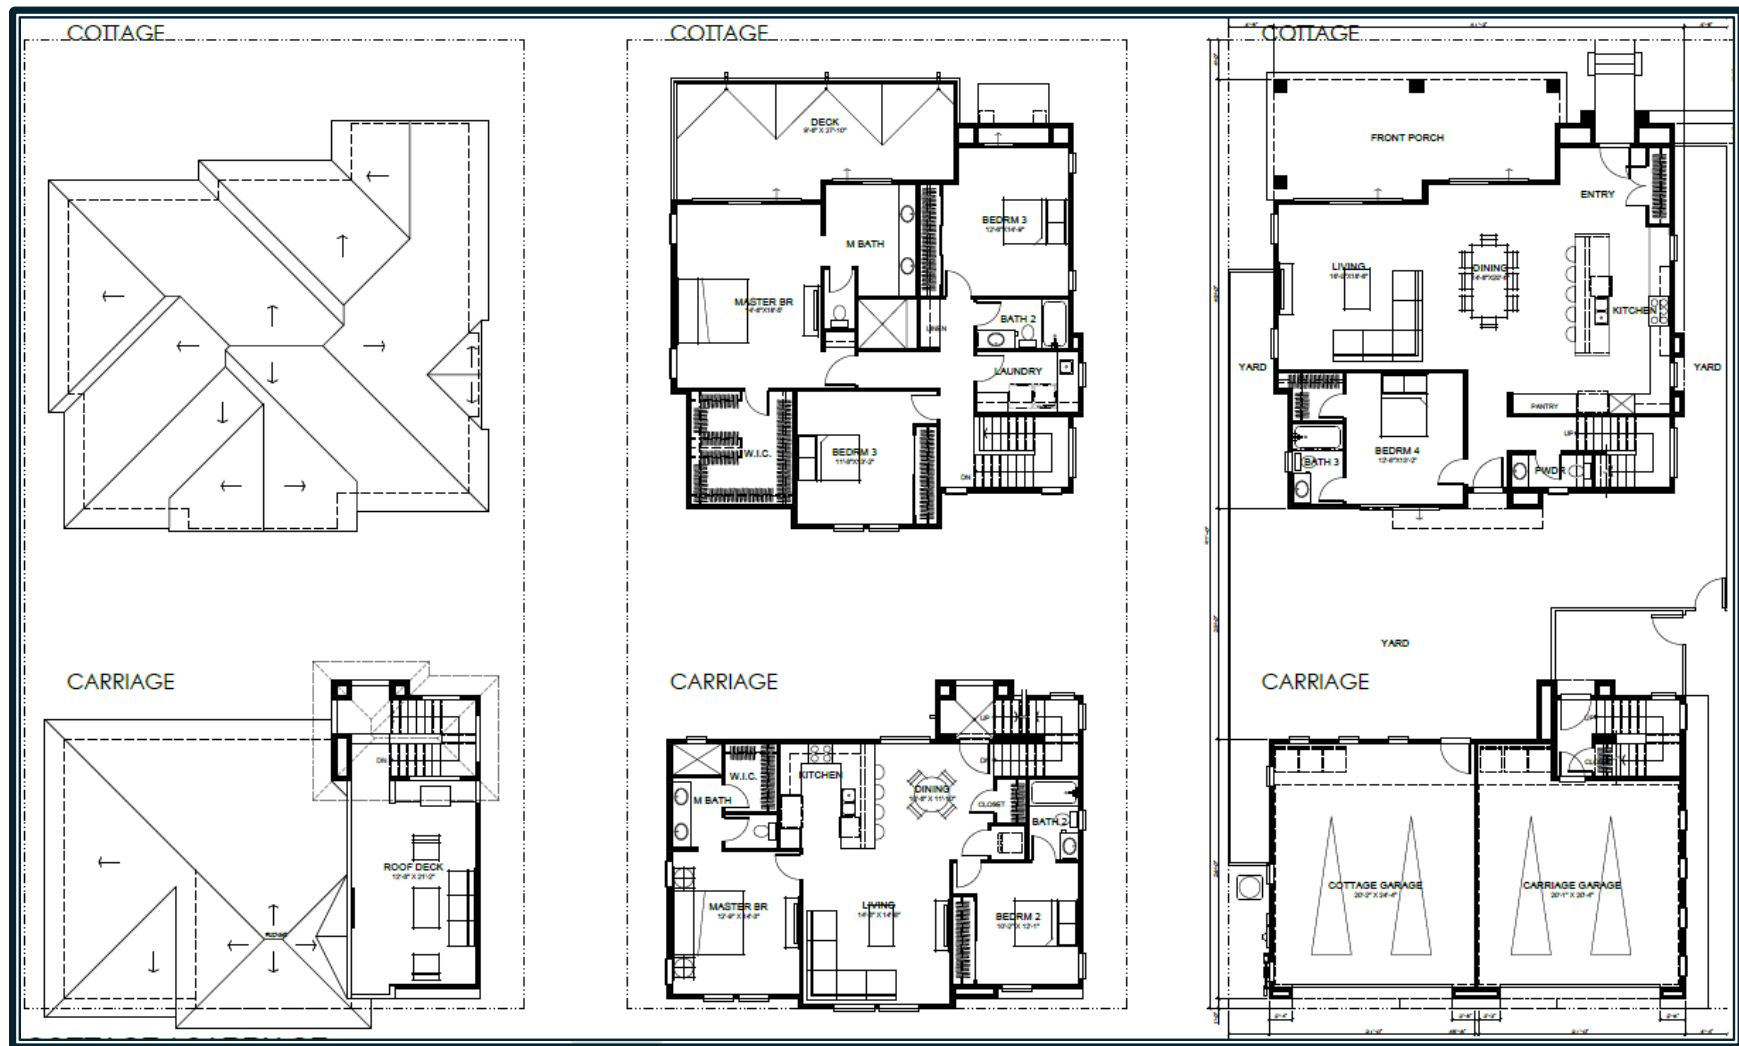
D, Conceptual Architecture (Cottage/Carriage Floor Plans)
